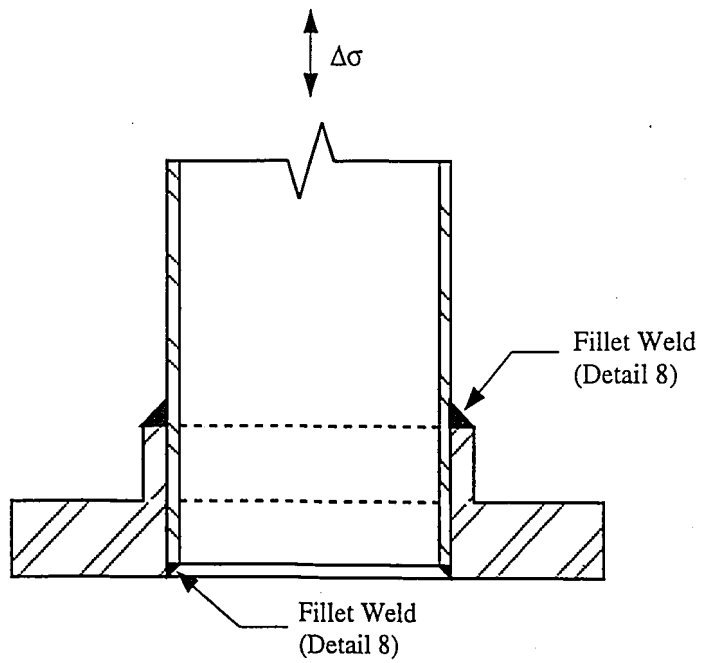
Fillet-Welded Socket Connection.
